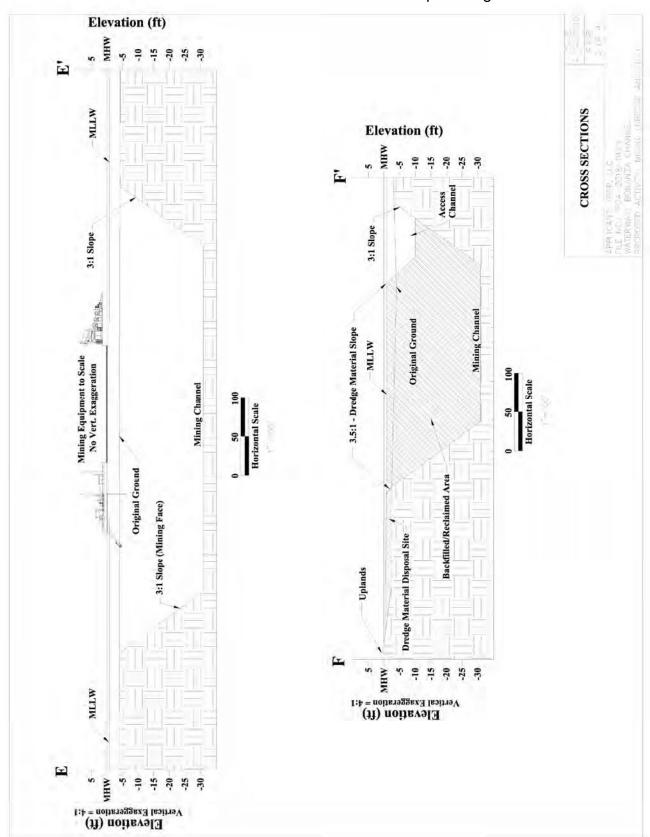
Cross sections of typical dredge and fill: E-E' and F-F'
